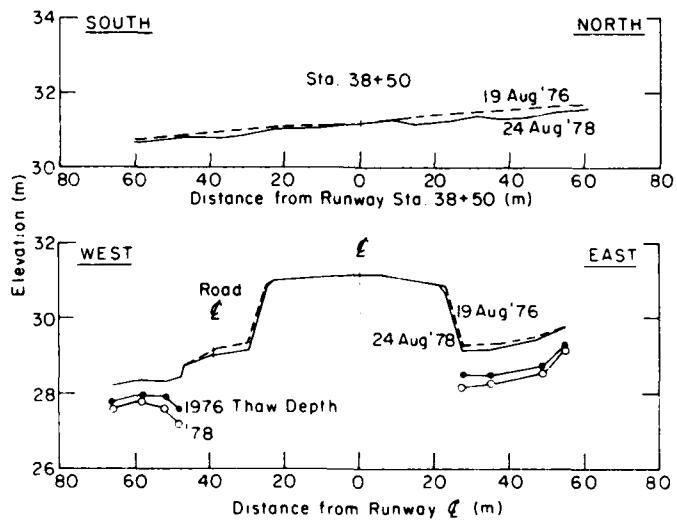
Surface elevations, north site, Dietrich Airfield. The upper graph shows the elevations on the centerline profile; the lower graph shows the elevation on the cross section, station 38+50.
